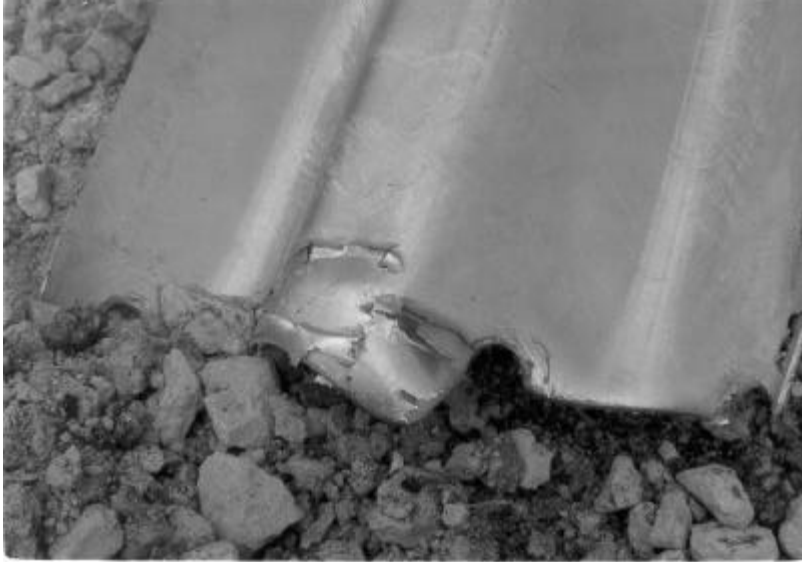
Ruptured rail element at splice in TTI Test 471470-23. (19)
